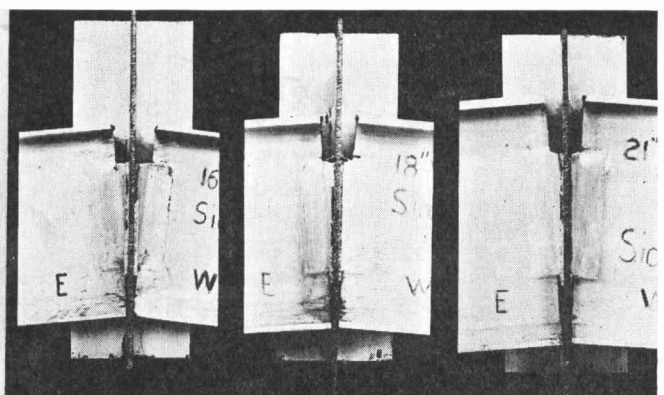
Web Angle Connections, No. 18, 19 and 20, Respectively, After Testing
